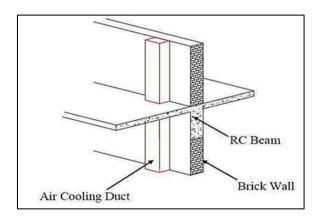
Air cooling duct through a slab (Flange of T-beam)
